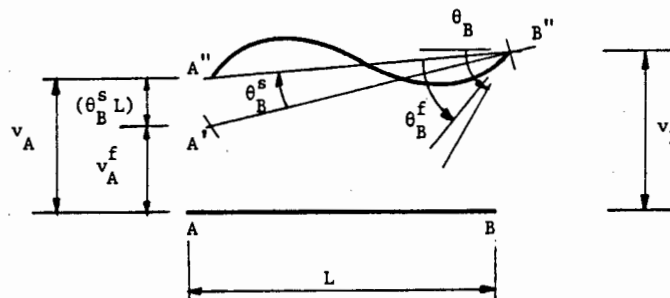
(c) : Deformed beam with fixed end rotation at end B
